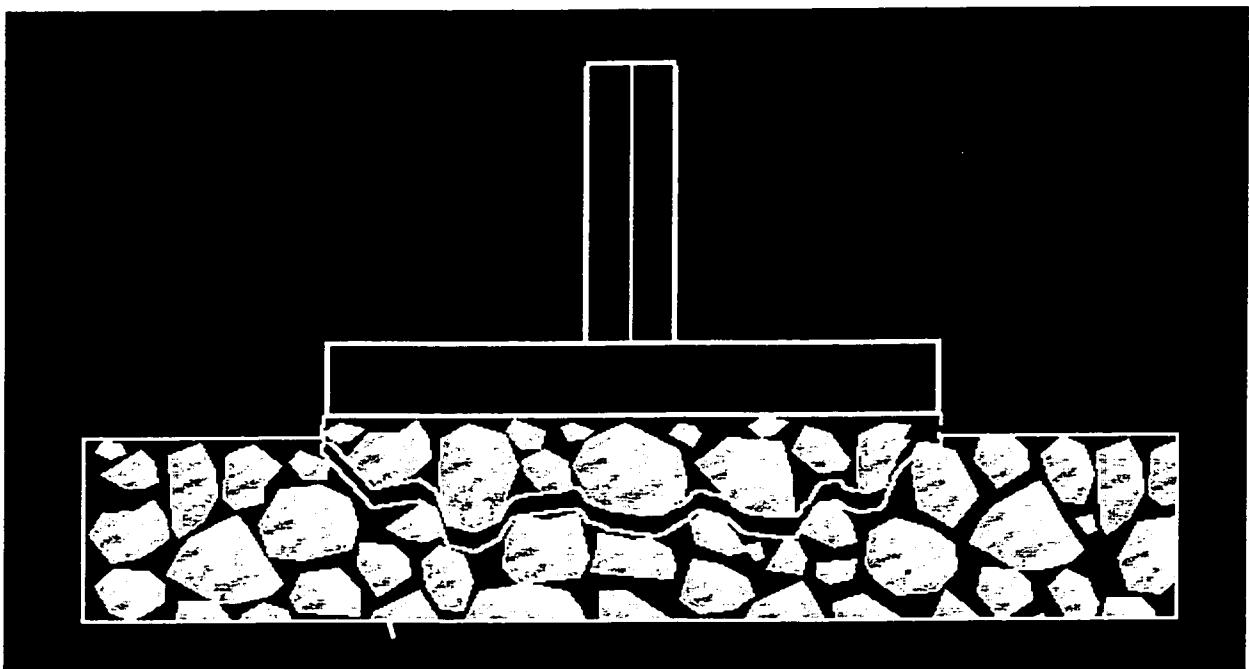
Induced Failure in Asphalt Concrete Pavement (ACP) Surface
